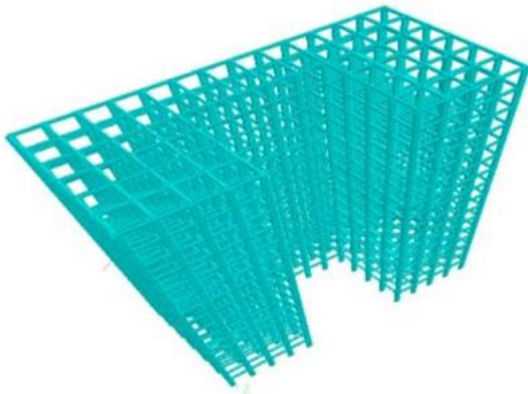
3D Elevation and plan of L- Shape Building
